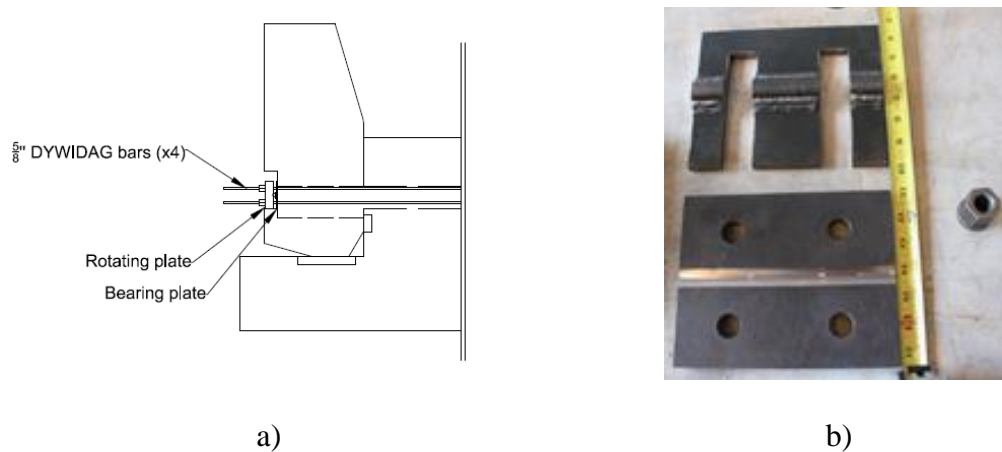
Hinge mechanism for bar anchorage: a) design drawing; b) bearing plate (top) and outer plate (bottom)
